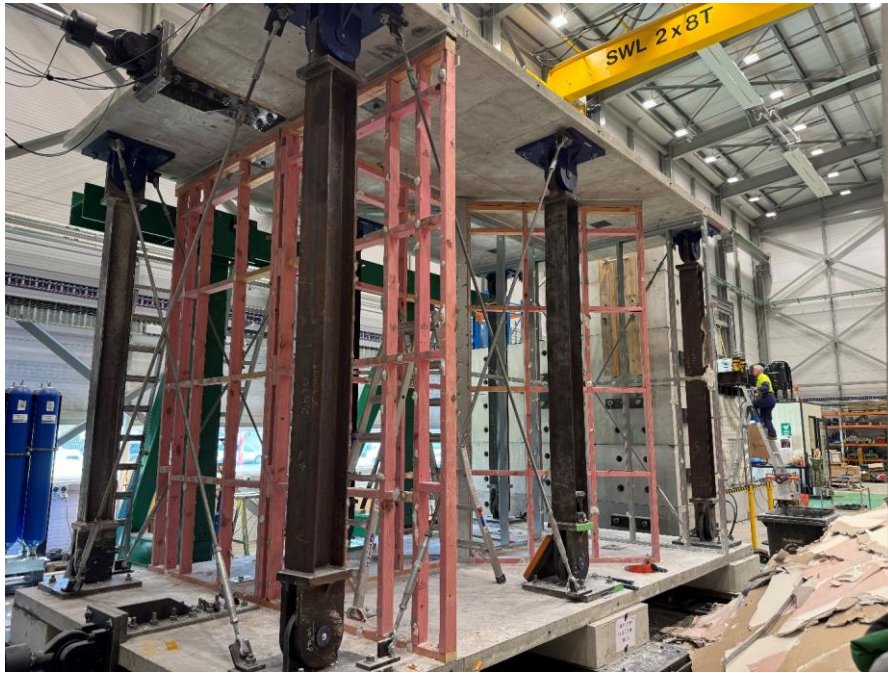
Photo of wall frames after motion 18 - 3 % inter-storey drift (Southeast elevation)
